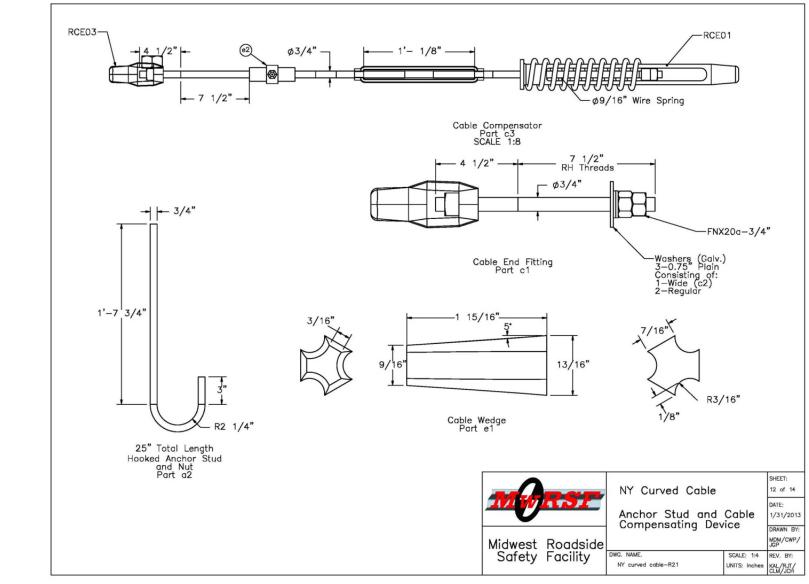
Cable Compensator Component Details, Test No. NYCC-1
